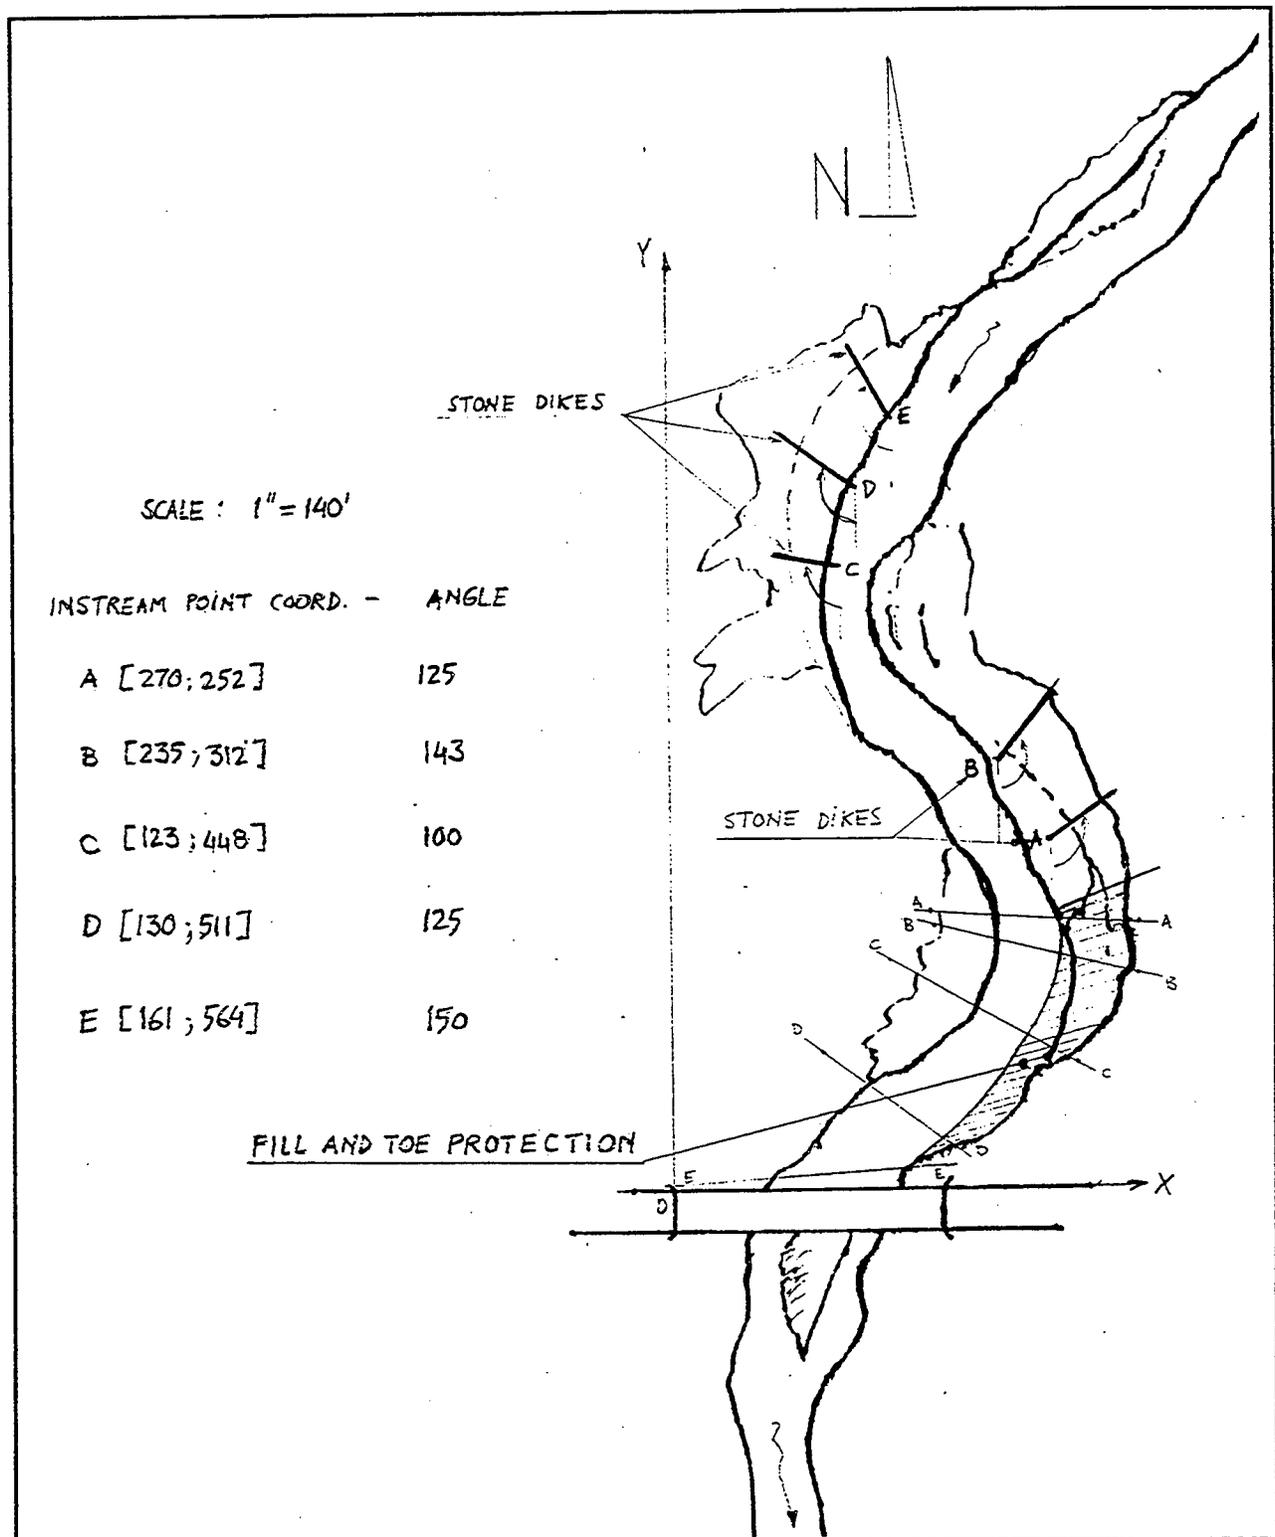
Piasa Creek alternative 1 design overview (aerial photo trace - 1994).
